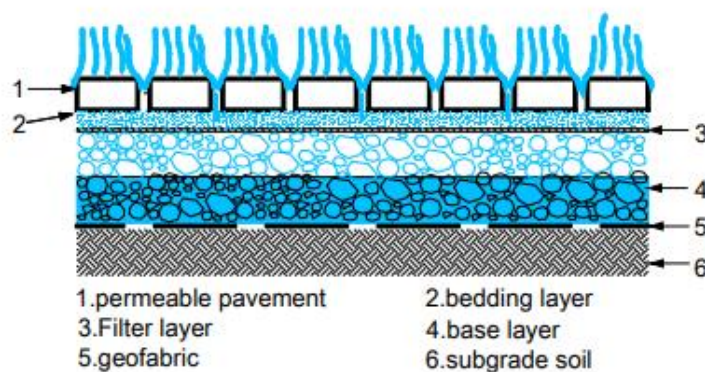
Schematic application of a water-retaining pavement system for stormwater storage and infiltration [3].
